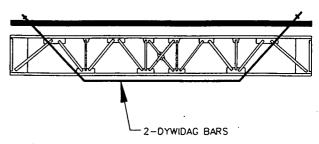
Burlington Skyway, floor truss post-tensioning (101).
